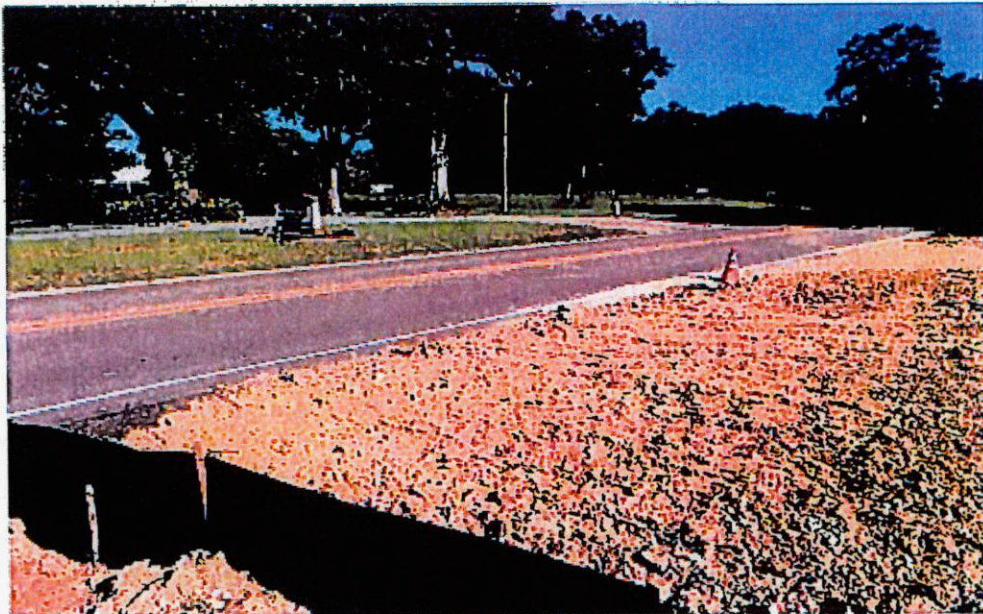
Facing north, culverts receiving drainage from Detention Pond to offsite.
